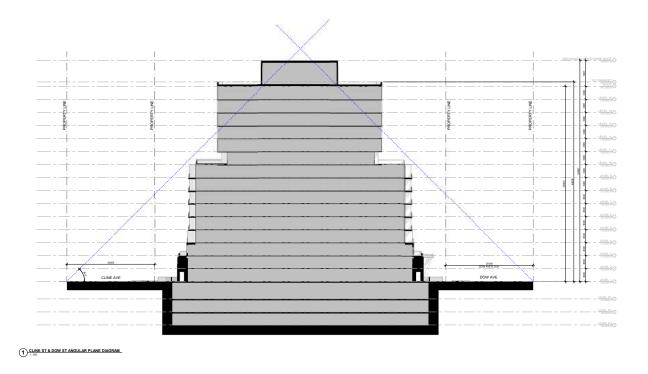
Cline Street and Dow Avenue Angular Plane (Source: srm Architects Inc.)
